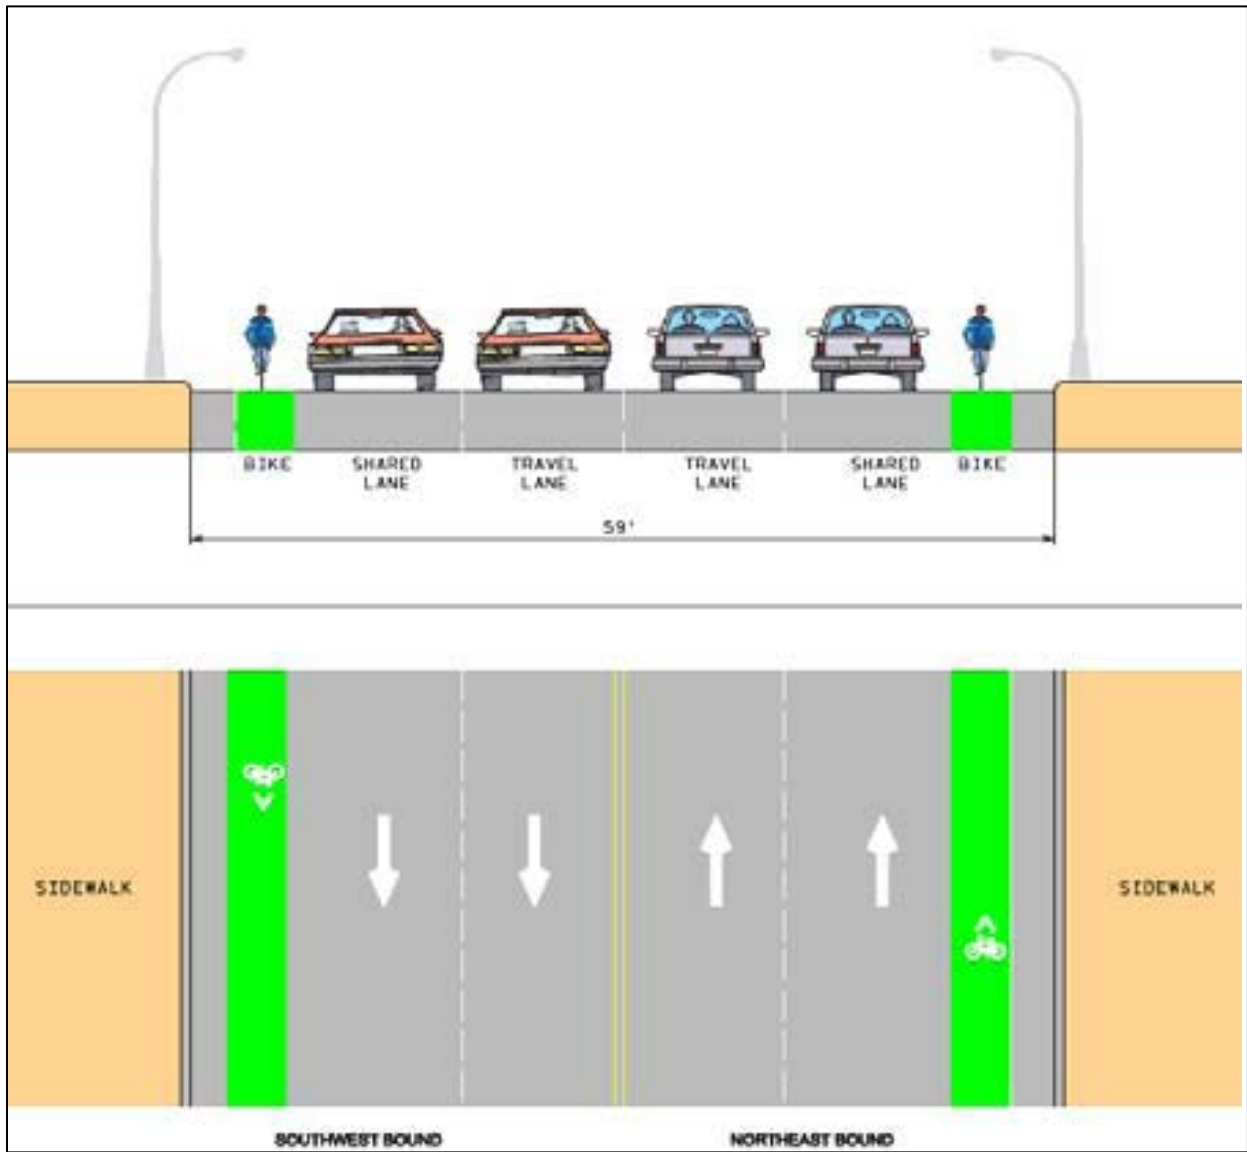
Example of Hennepin Avenue Proposed Cross-Section After Reconstruction
